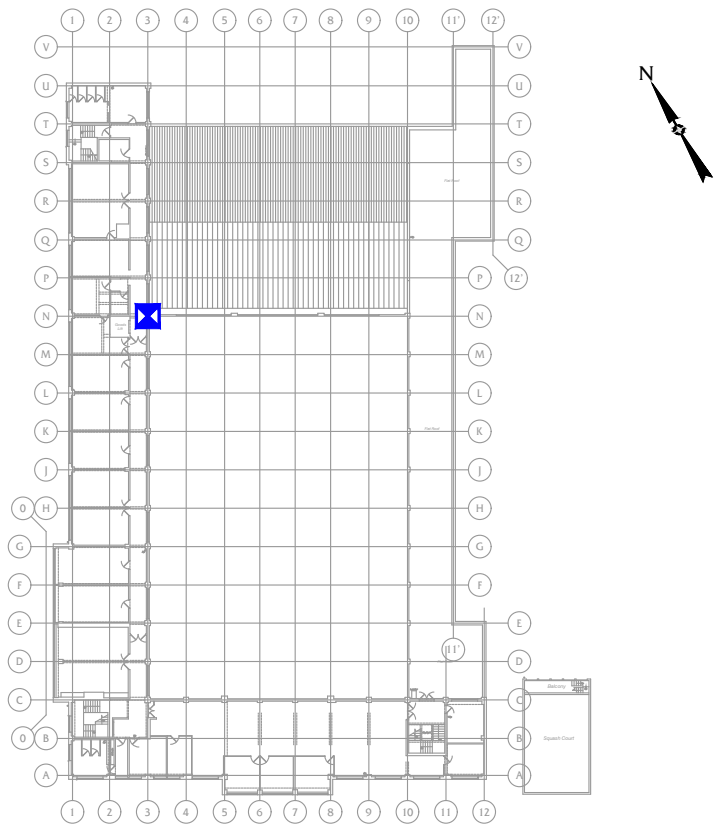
SCHEMATIC ELEVATION SHOWING BEAM / CHANNEL LAYOUT - SURVEY AREA N3 NOT TO SCALE
